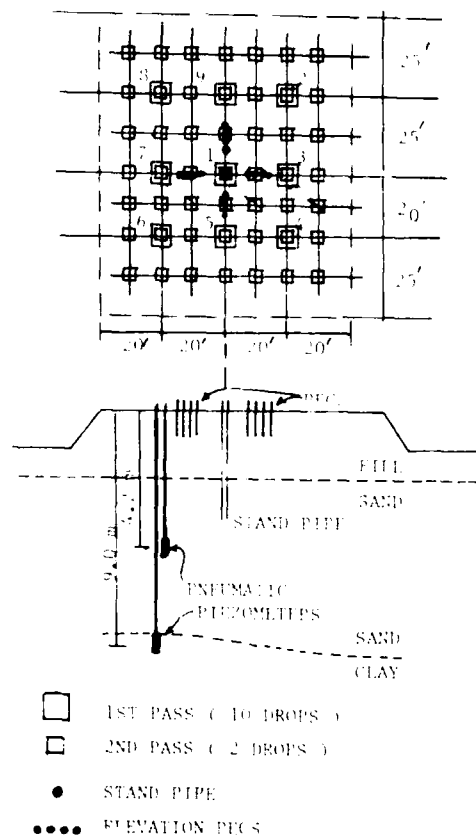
PLAN AND CROSS SECTION PILOT TEST AREA
